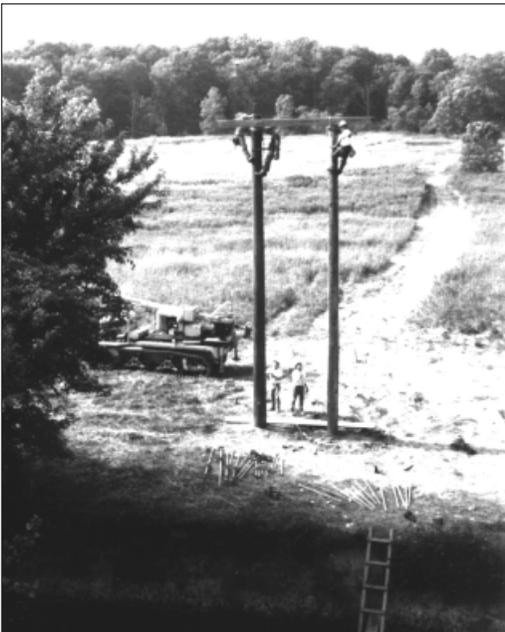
GPU Energy volunteers installing the tower cross-bracing on the west tower. *Photo Courtesy of Mr. Paul DeCoste.
